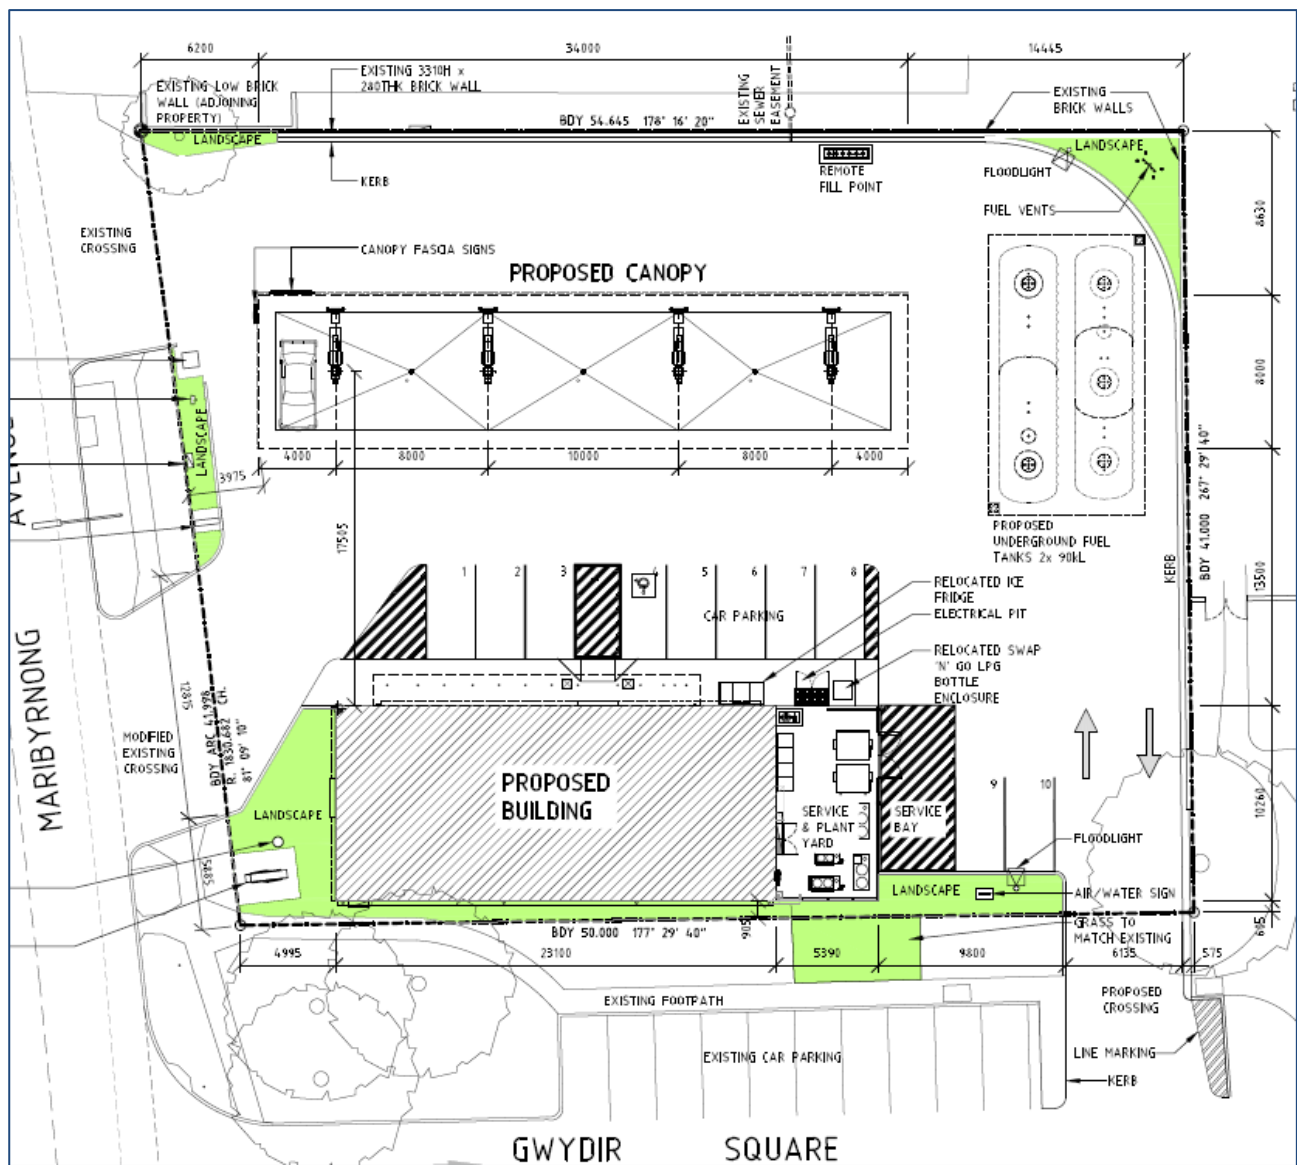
Extract of Proposed Site Plan (source: TfA)
